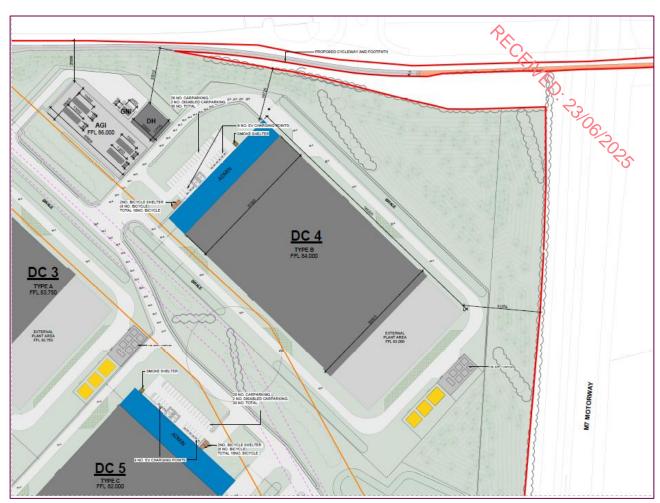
Previously Submitted Proposed Site Plan B (extract of submitted drawing 22217-RKD-ZZ-ZZ-DR-A-1012-PROPOSED SITE PLAN B)
